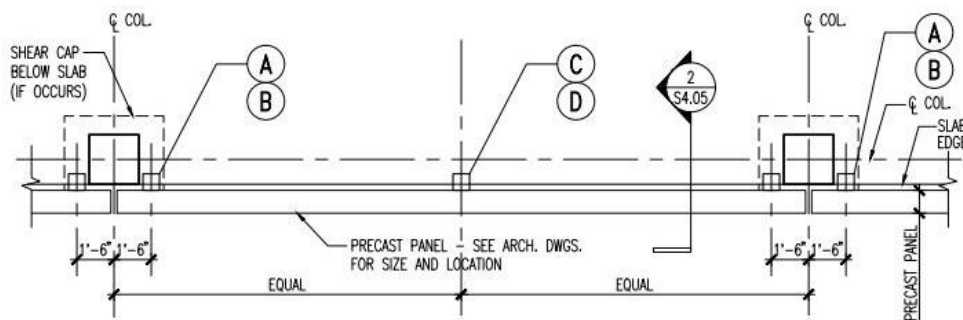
Precast Plan Detail – by Cagley and Assoc.
